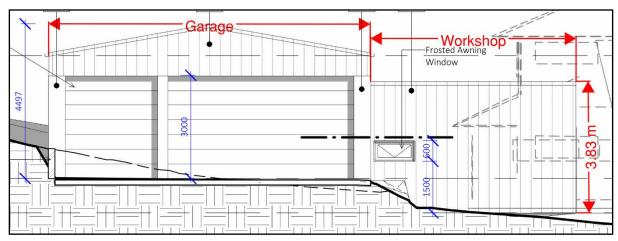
excerpt of the submitted Northern Elevation showing the height of the proposed outbuilding.
